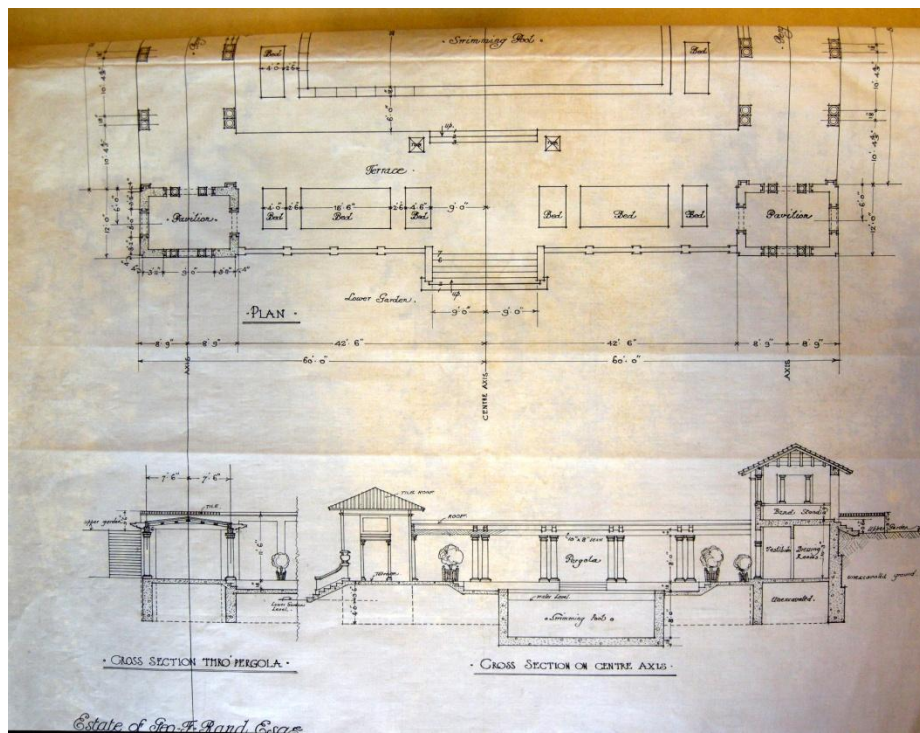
200 John Street, Designed Dunnington-Grubb Landscape, First Pool and Pavilion Design, Undated
